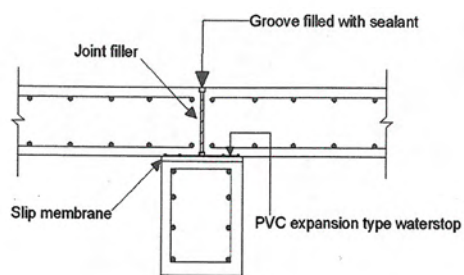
Typical intermediate expansion joint in roof to division wall sliding joint
